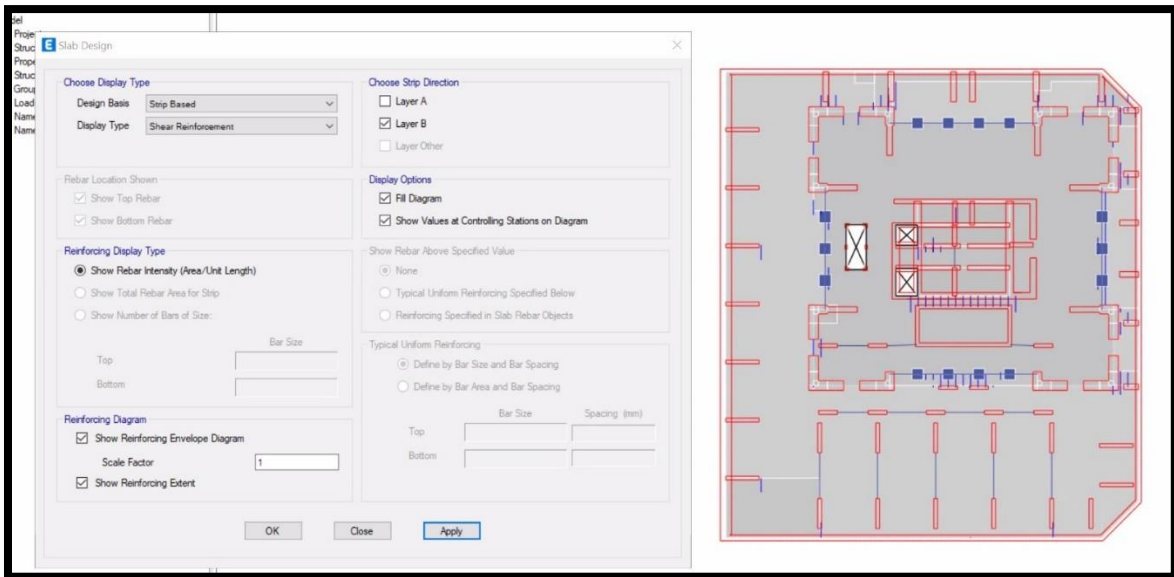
Shear Reinforcement in Y-Direction for Ground Floor
